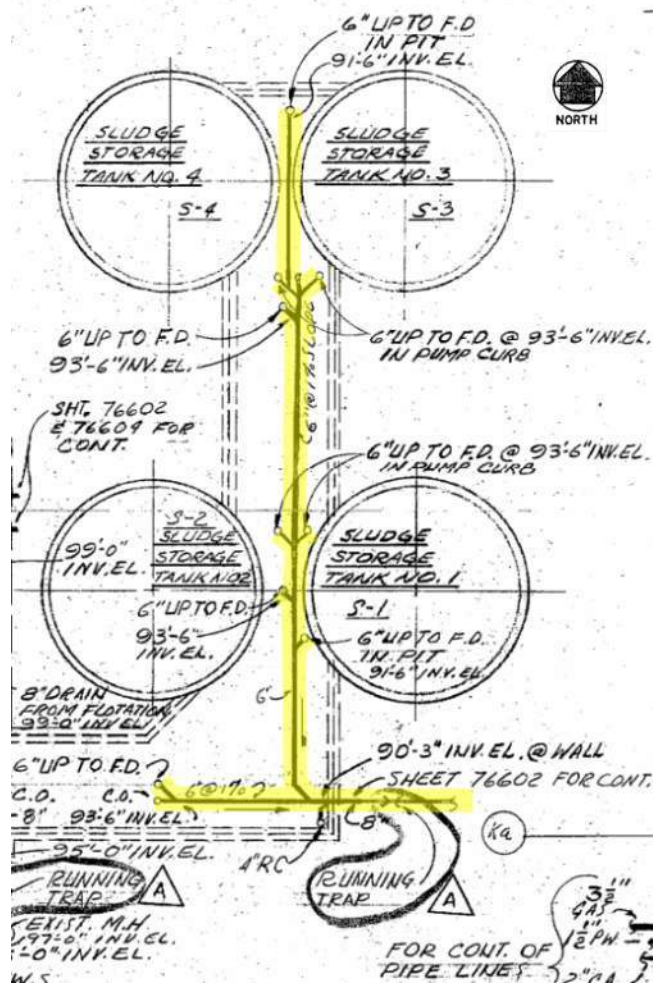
SSTs 1-4 Pipe Gallery Sanitary Drain Piping
